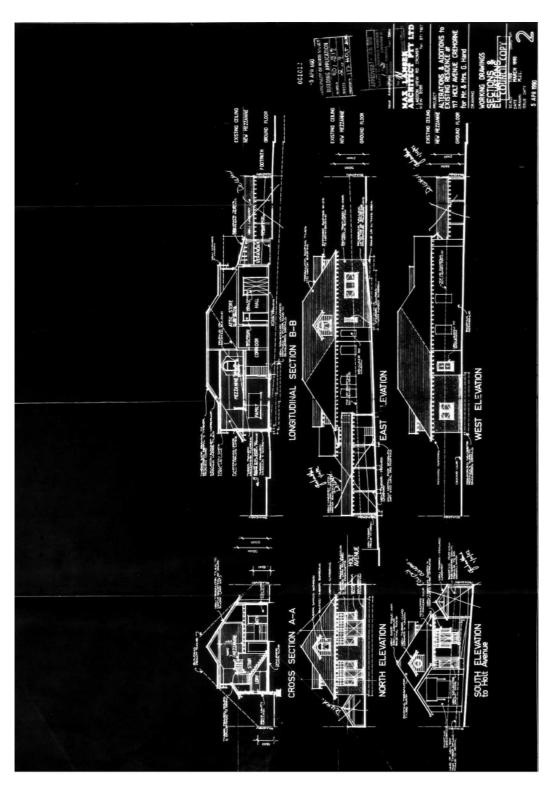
Sections and elevations—alterations and additions to existing residence at 117 Holt Avenue, Cremorne, for Mr and Mrs G Hand, March 1990 / Max Lanser Architect Pty Ltd. (Source: North Sydney Council, Building Application 90/11, Sheet 2 of 2)
